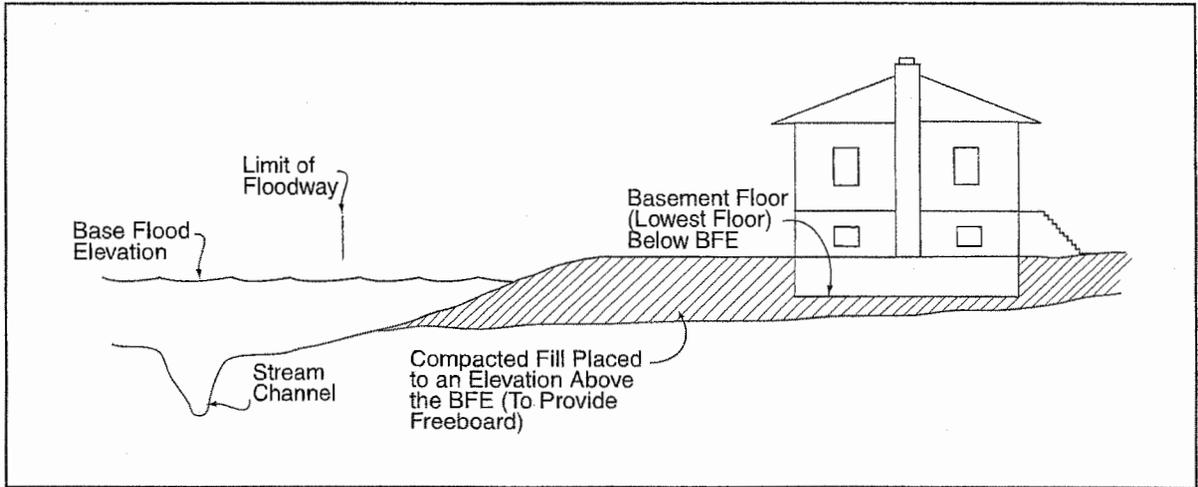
Basement foundation in fill placed above the BFE. The depth of the basement floor below the BFE is less than when no fill is placed.
